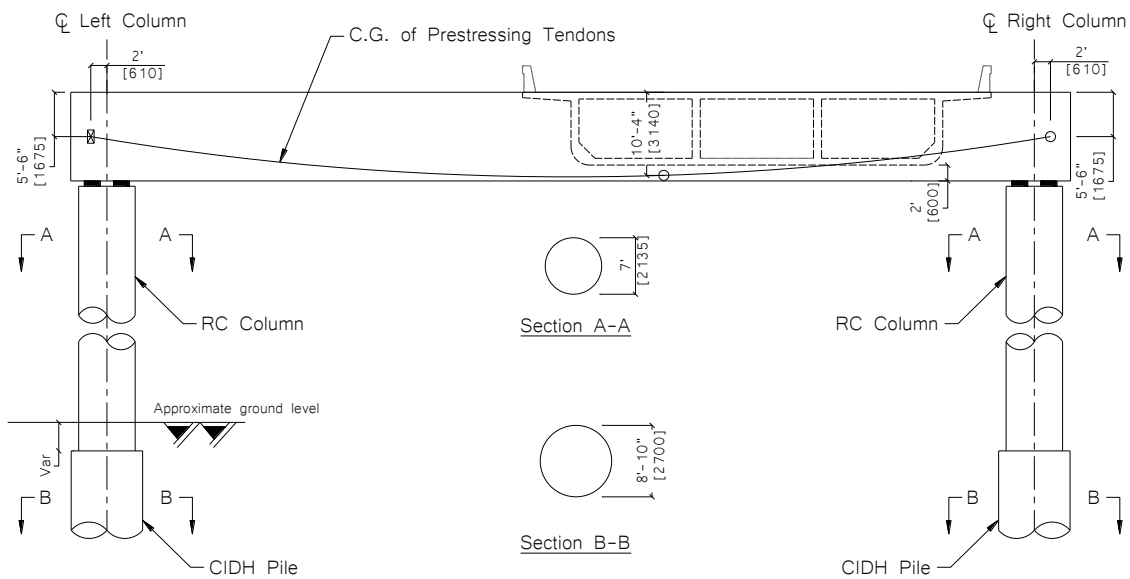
Outrigger bent details, Frame 2, Bridge 2
